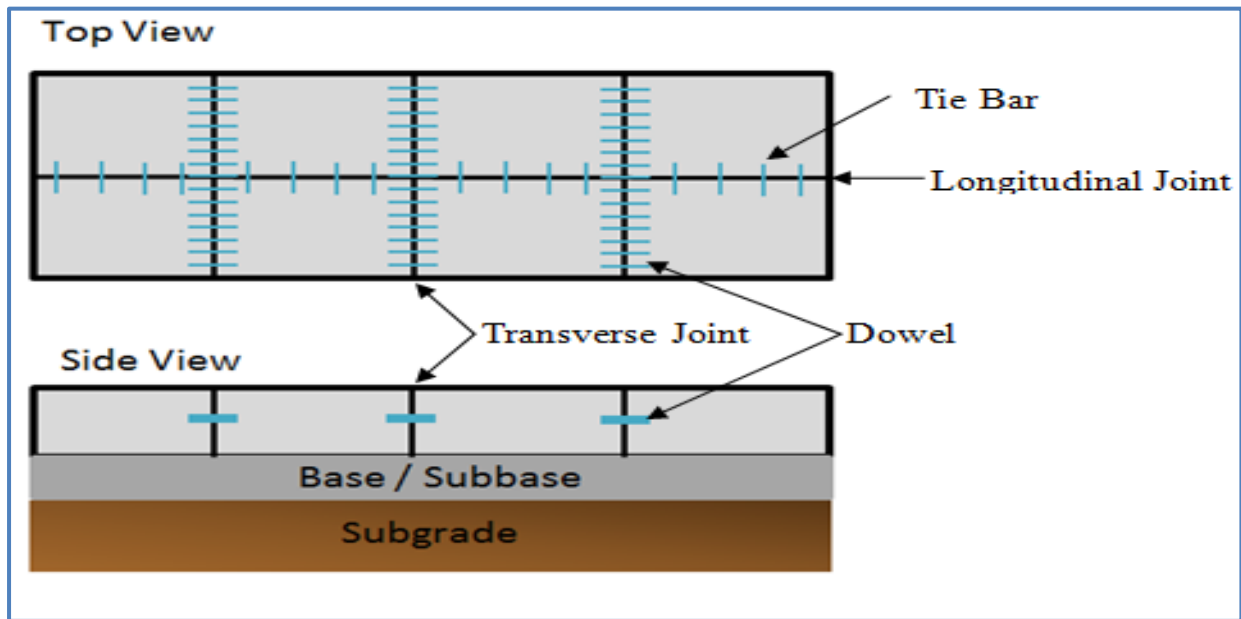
Cross-section of JUCP (WSDOT 2011)
